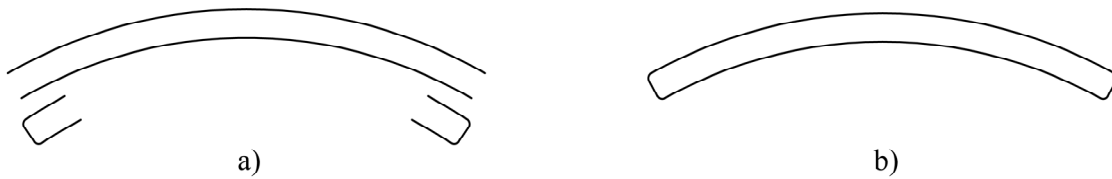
a) Traditional GFRP longitudinal reinforcement; b) New GFRP “closed-rings” reinforcement.
